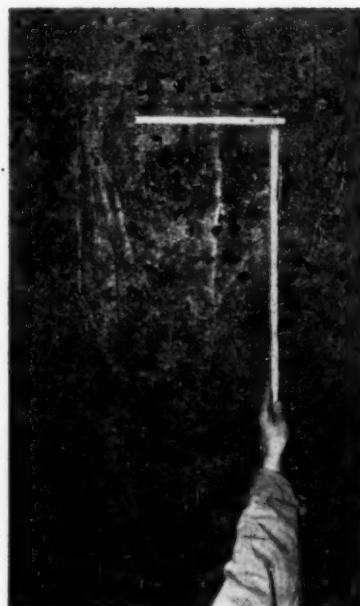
EAST SIDE WALL OF TUNNEL, JULY 20, 1947
